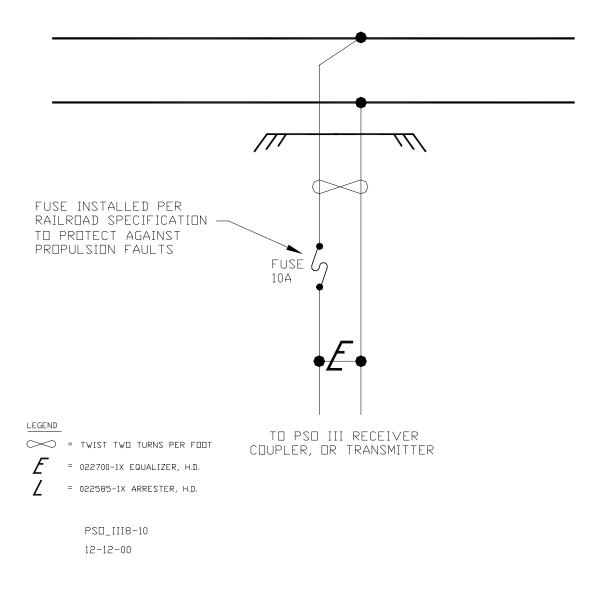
Typical Track Wire Surge Protection For Use In Electrified Territory
